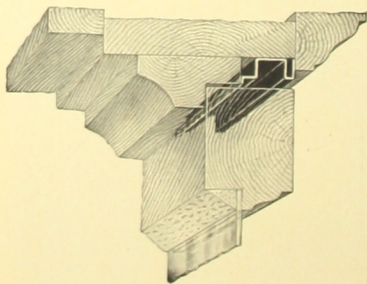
Cross-section thru sash and window frame at top showing installation of "AiR-Way" track above sash and tight application of sash.
